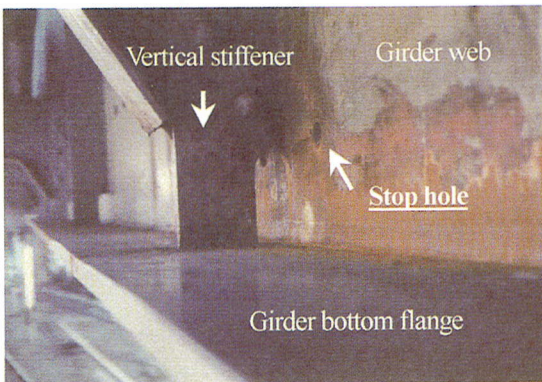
Example of "Repair G" performed by stop hole at the girder web in Shinkansen bridge.
